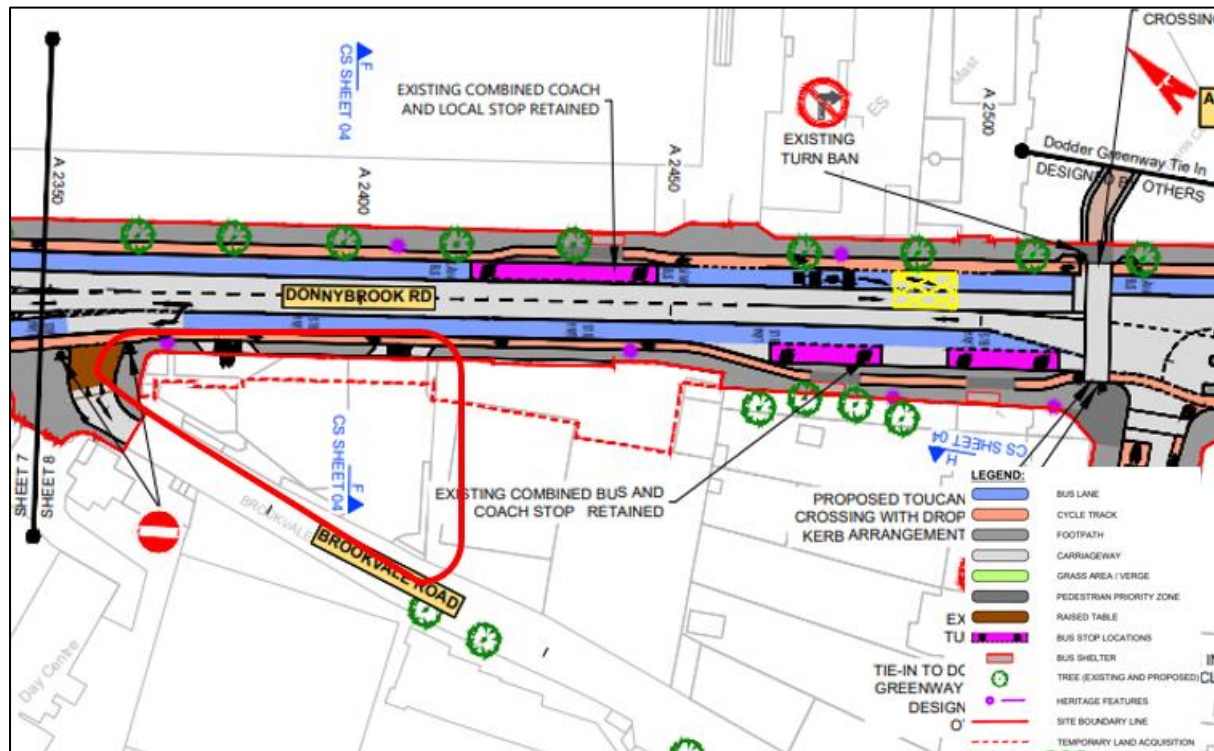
Extract from General Drawing Arrangement at Donnybrook Road (Sheet 08)
